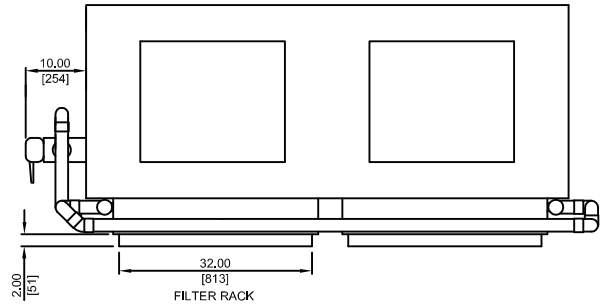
50BVC,J,Q020-028 with Optional Waterside Economizer Dimensions
